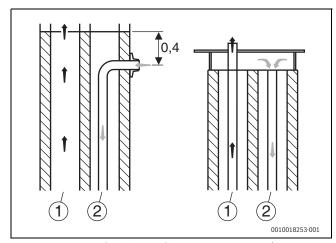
Examples of the design of the opening apertures (dimensions in mm)
